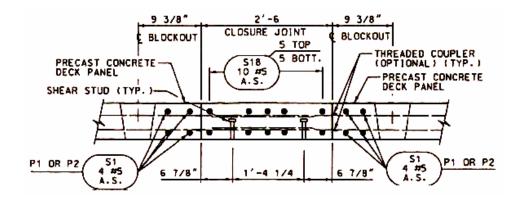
Lap splicing of longitudinal reinforcement used on Structure C-437, Wanship, Utah
